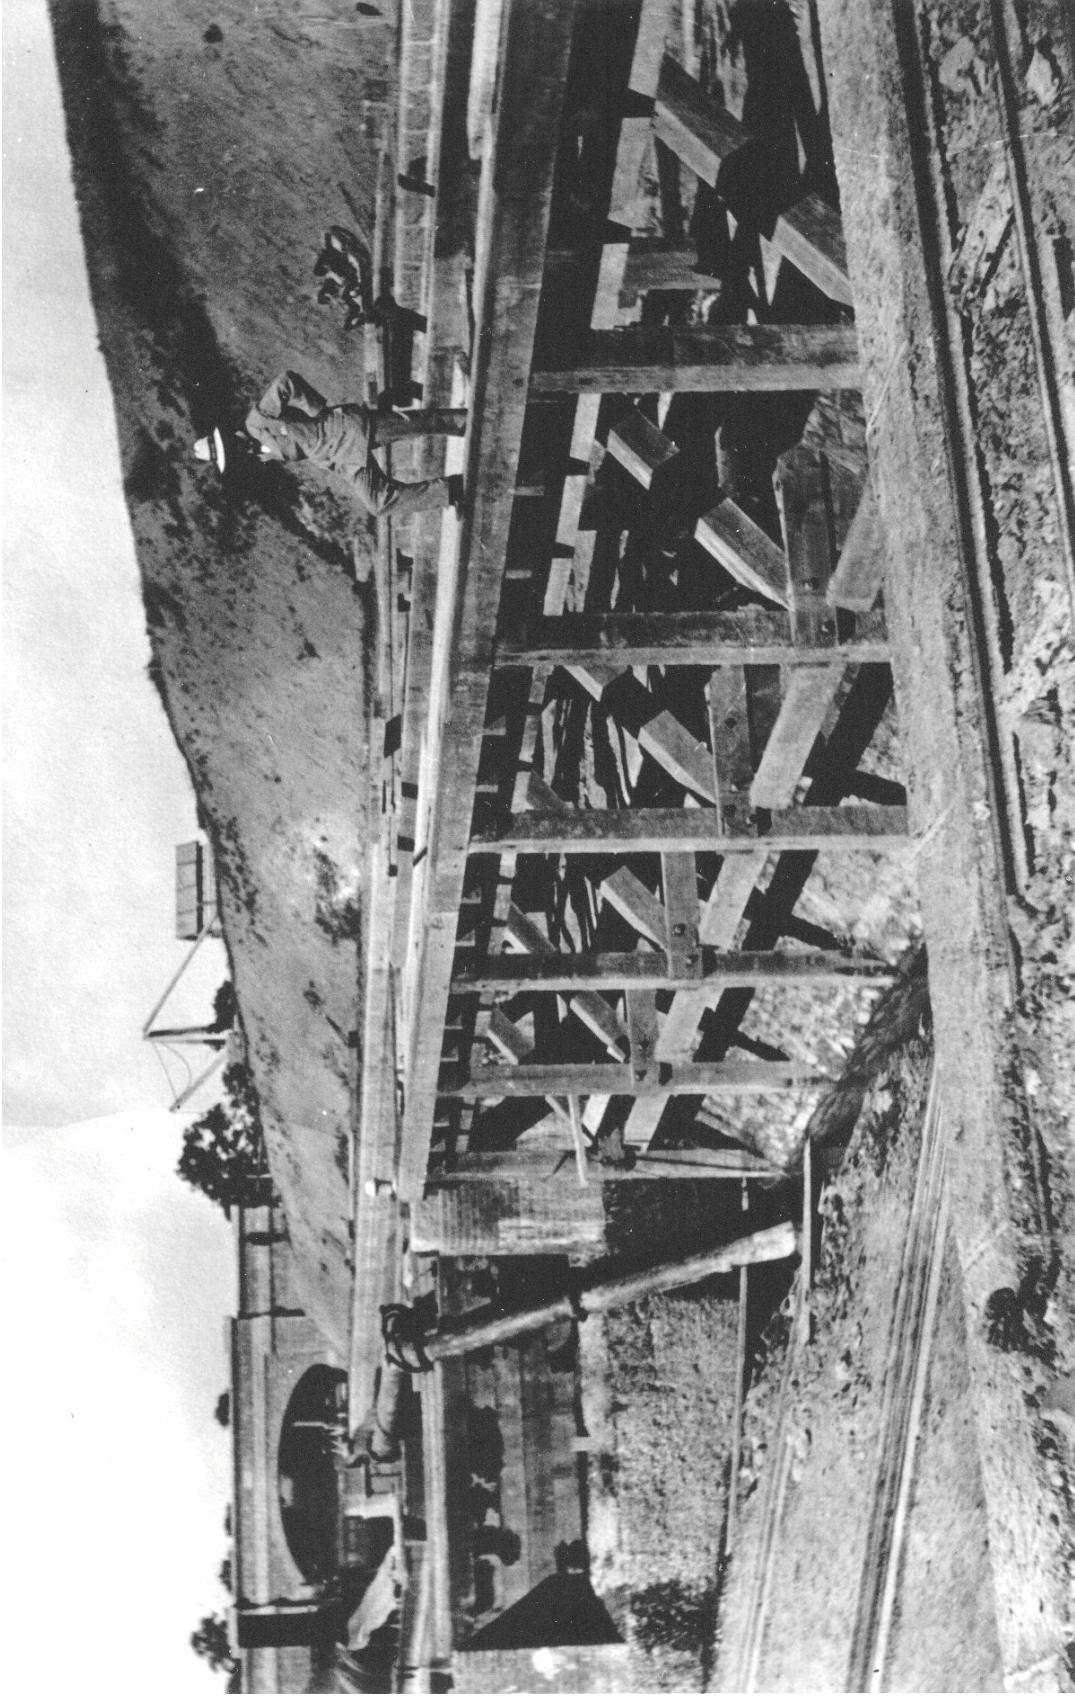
Gordon Cale Thomas poses on the walkway under construction in the late nineteenth century. Detail of the walkway foundations are visible (Appendix 1)
